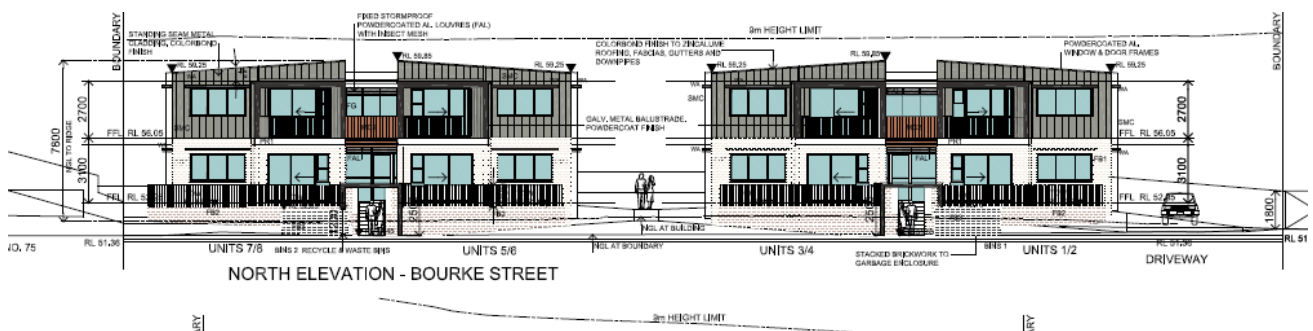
Proposed Bourke Street Elevation. Source: Barry Rush & Associates Pty Ltd
